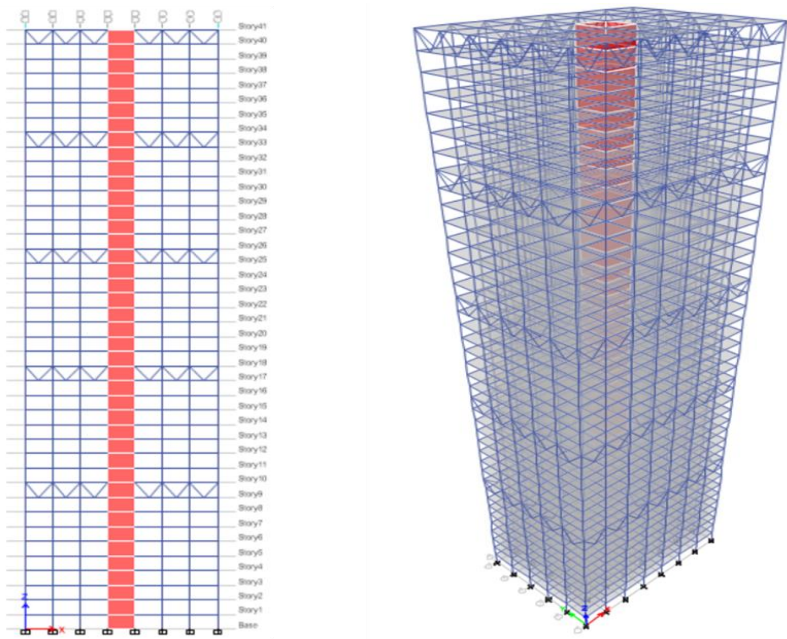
Model of G+40 Building using outriggers by V type bracing positioned at 9th, 17th, 25th, 33th, 41th Story
